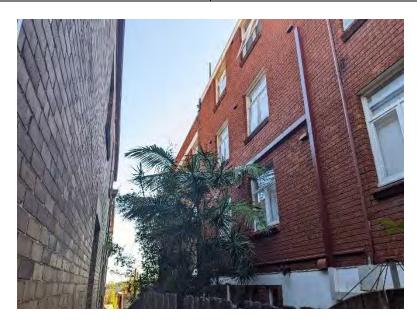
View from western side setback, looking south. The subject building is at the left of the photo, and 25 Fletcher Street is at the right of the photo
